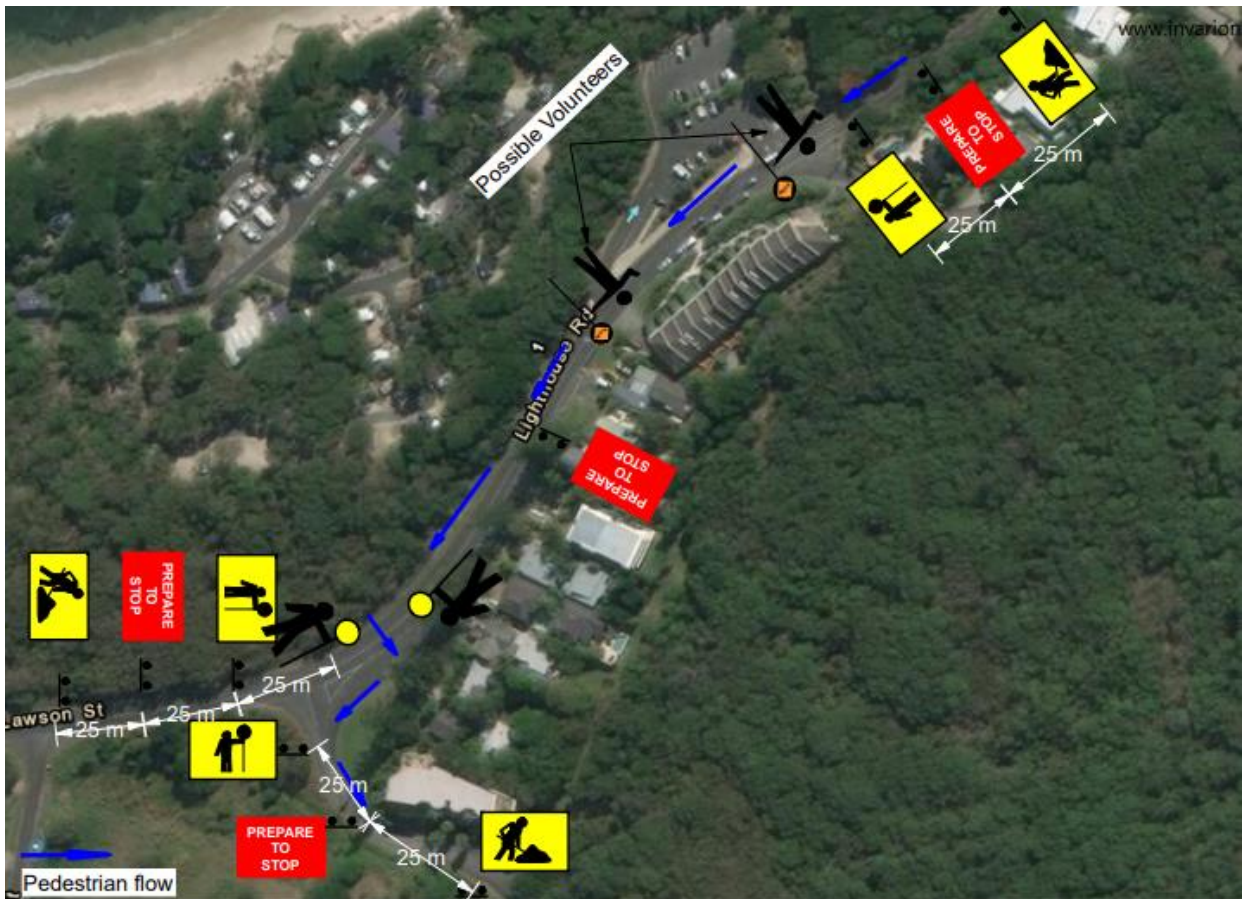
Traffic control proposed for the western section of Lighthouse Road entering Tallow Beach Road (refer to Figure 1.) Traffic control to be in place between 6am and 10.30pm
